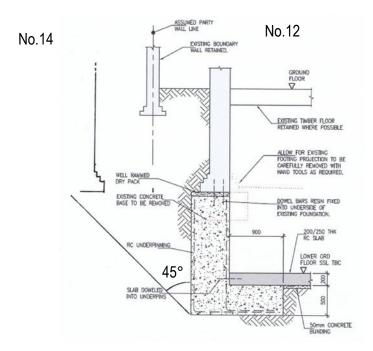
Section 4-4 from HRW drawing 1031/PL/06 rev.P1 showing foundation to No14's flank wall (level assumed = to No.12's) and 45 degree influence line from proposed basement excavation.
